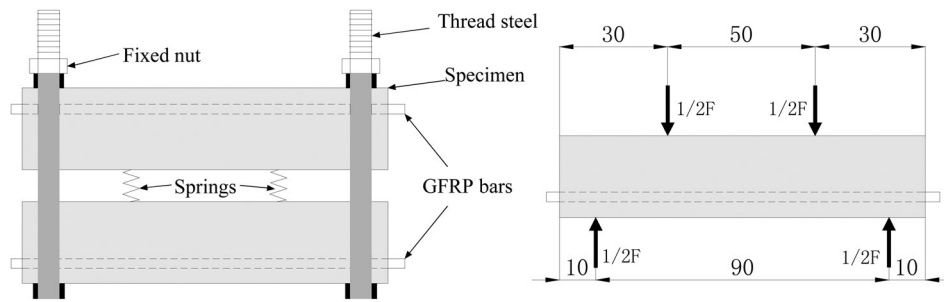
Sketch illustrating typical GFRP bars embedded in concrete beams.
